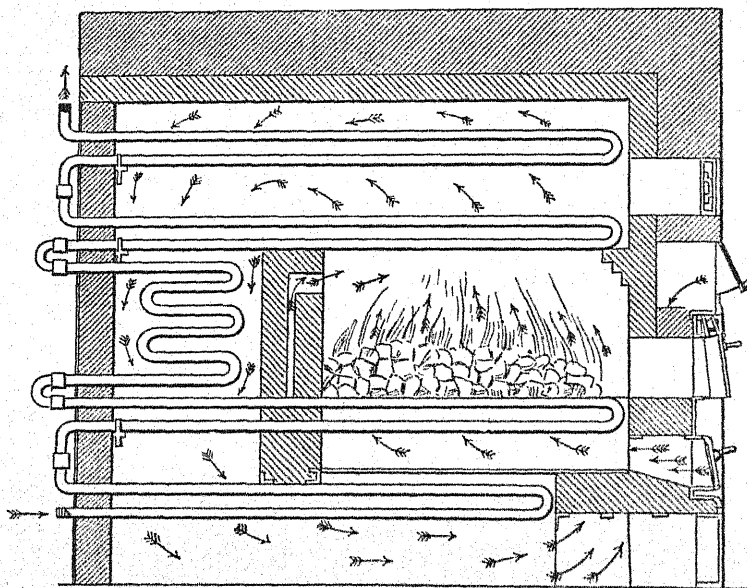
Section of the "Renton Gibbs" Tubular Boiler.
